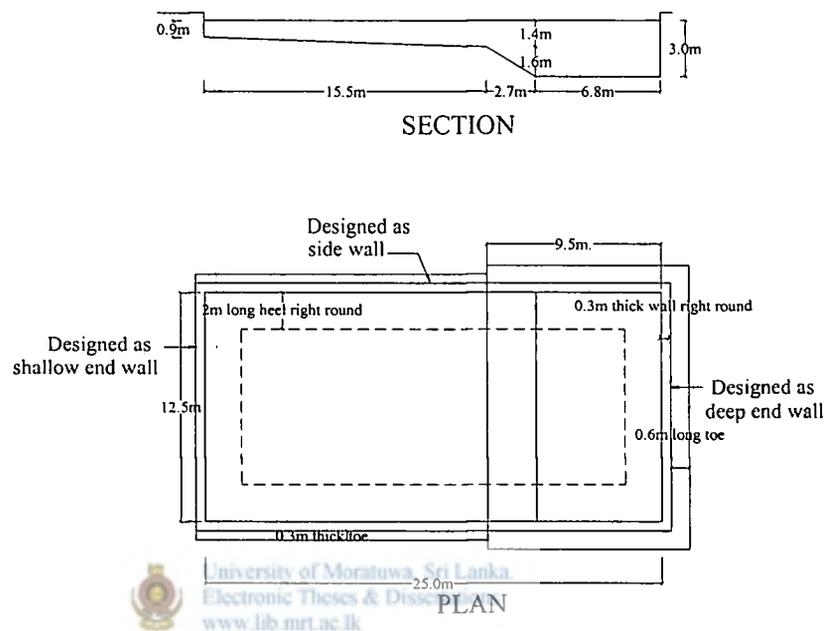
Plan and section of conventional swimming pool with a deep end
